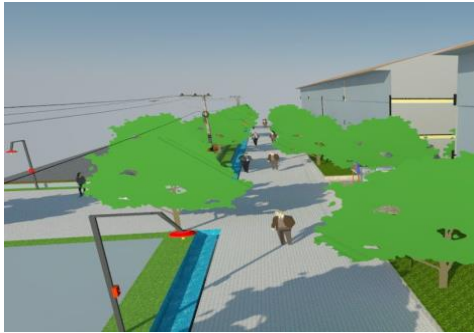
3D Illustration placement of electric pole and street lighting in the settlement of Jembatan Beton Way Blau [11]
